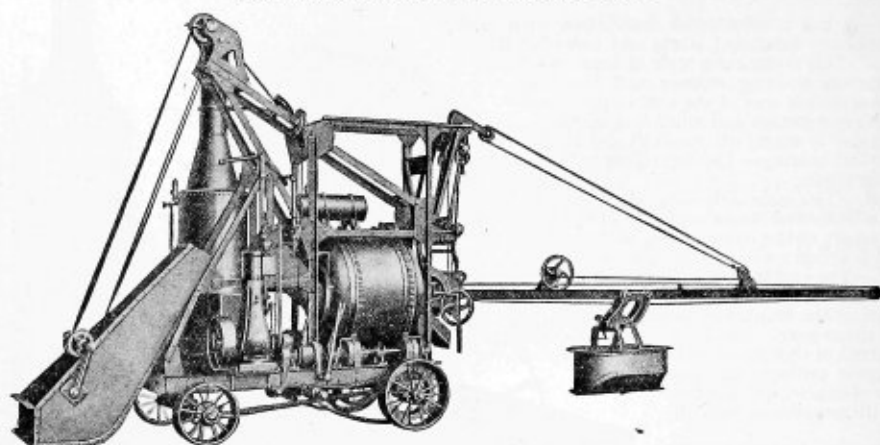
Fig. G. Showing No. 14 Special Paving and Road Building Mixer with 20 Ft. Delivery Boom and Bucket
